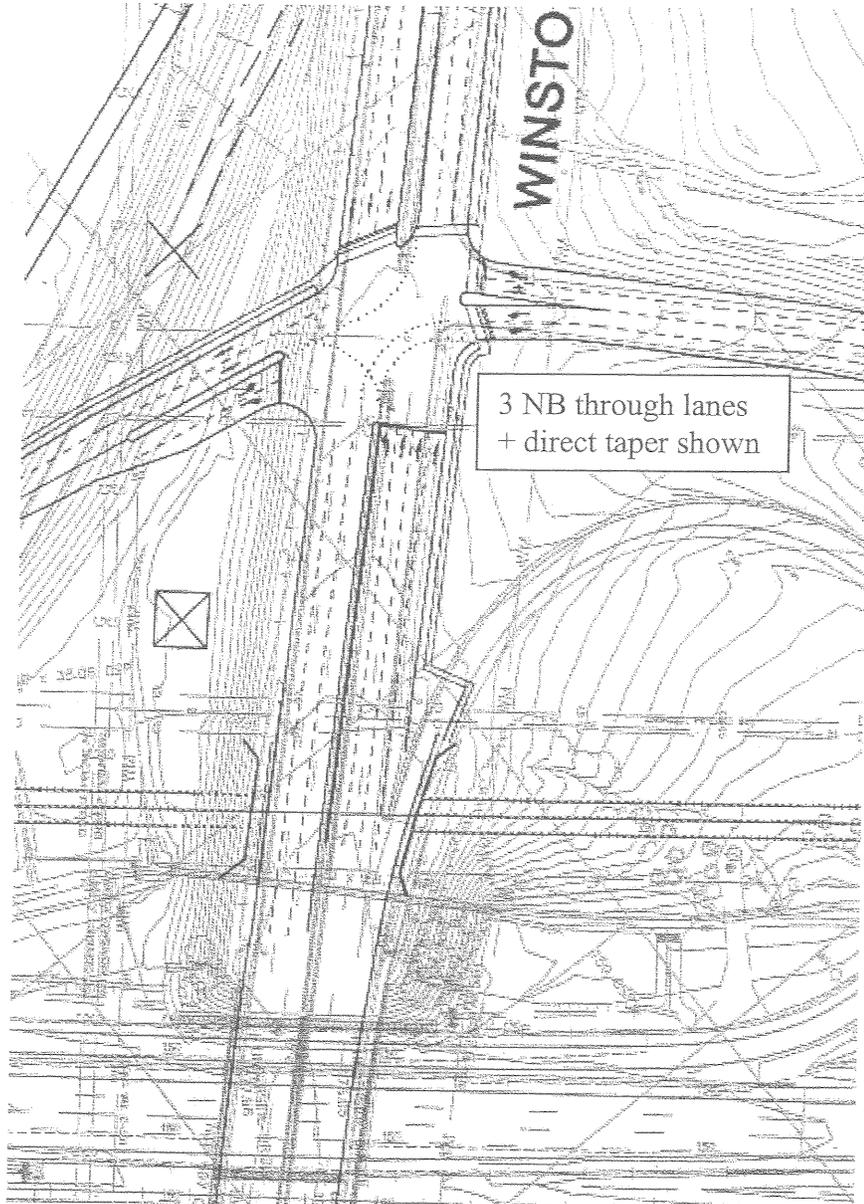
/4b: PHM Drawings for Winston Churchill Boulevard and Erin Mills / E-N/S Ramp Intersections
